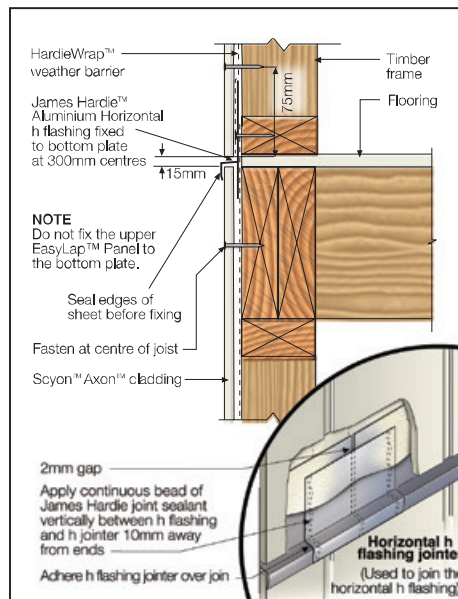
UPPER FLOOR JUNCTION/HORIZONTAL JOINT
